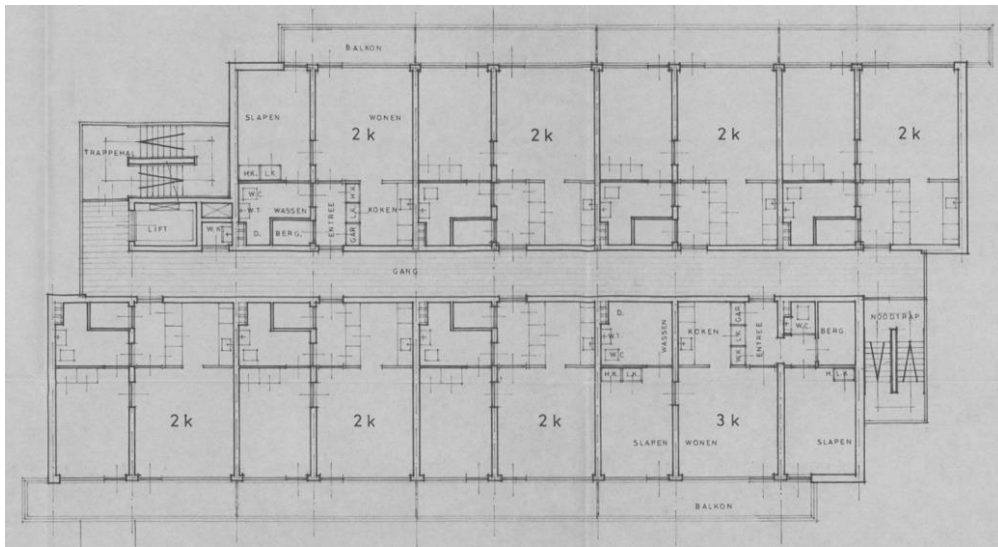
The floor plan of the apartment buildings (source: ARCHITEKTENBURO VAN DE KERKHOF).
